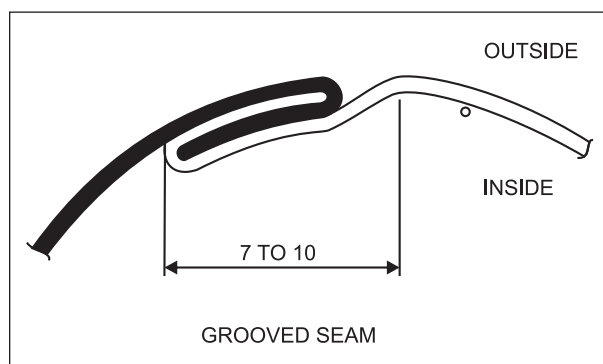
Configuration of longitudinal seam in GS/SS circular duct with flange joints
